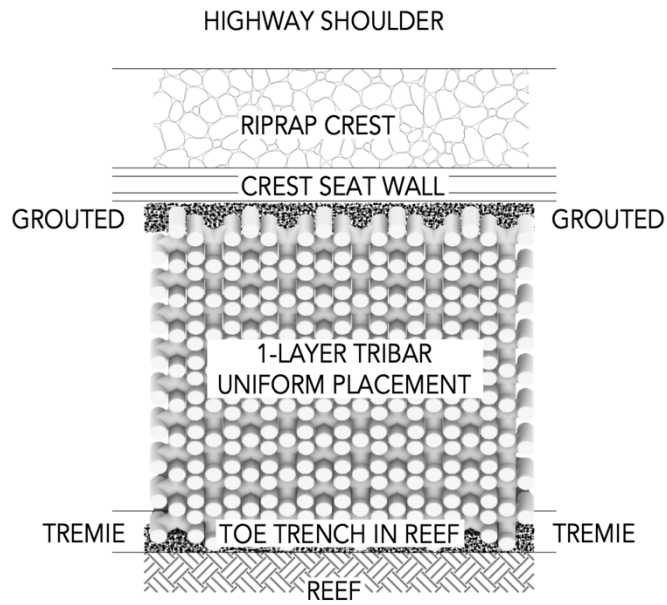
Tribar 1:1.5 slope revetment, plan view example of unit placement
